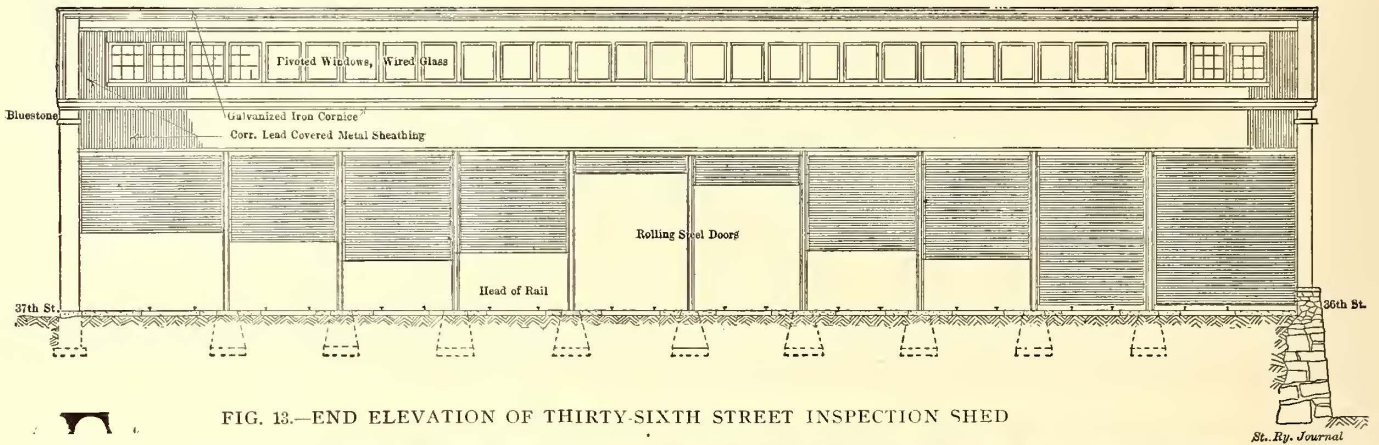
END ELEVATION OF THIRTY-SIXTH STREET INSPECTION SHED
